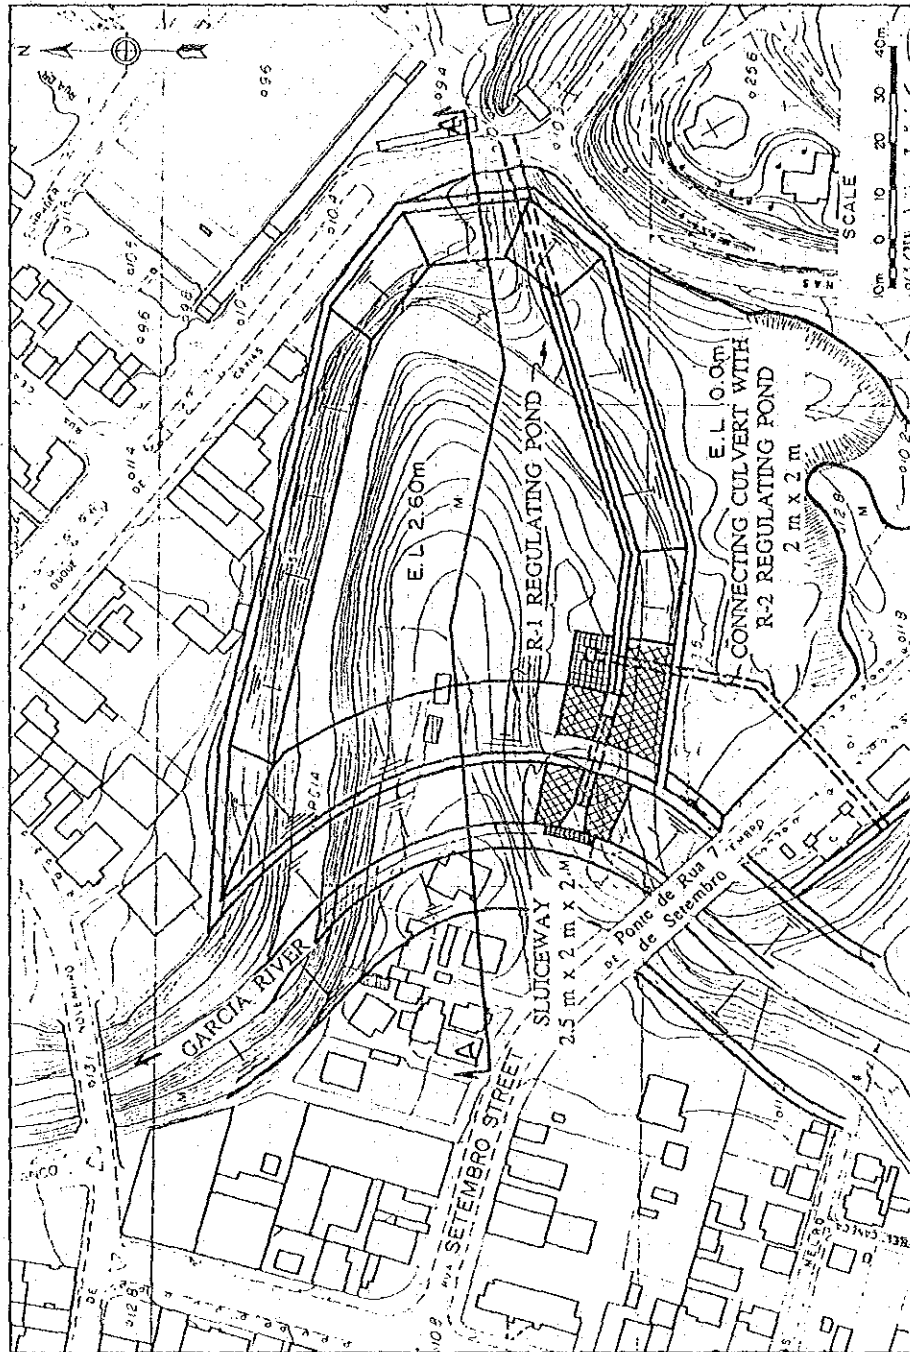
GENERAL PLAN OF DRAINAGE FACILITIES (2/2)
